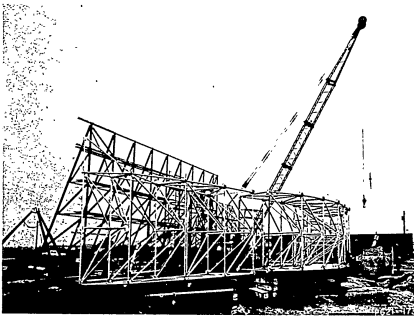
Subassemblies of center and two end sections of reflector truss. Rear support leg being raised into position prior to lifting center section.
